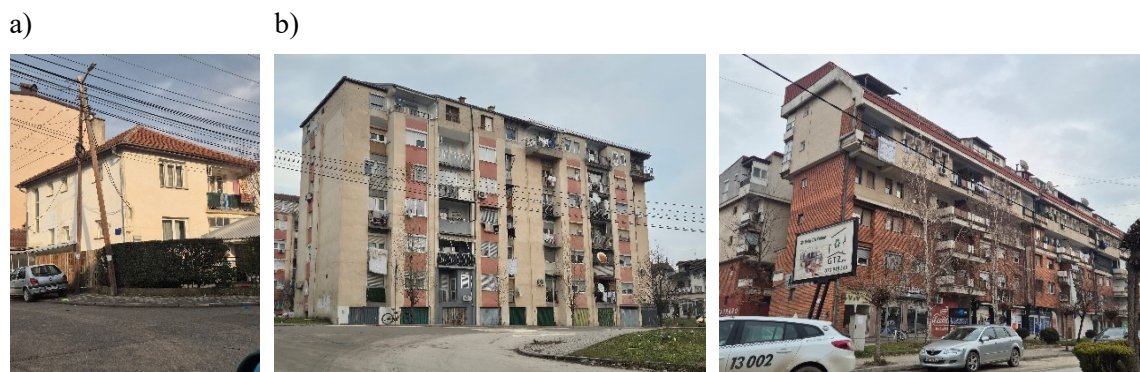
Unreinforced masonry with rigid diaphragms a) single residential house; b) multi-dwelling building, Gostivar (URM3).
